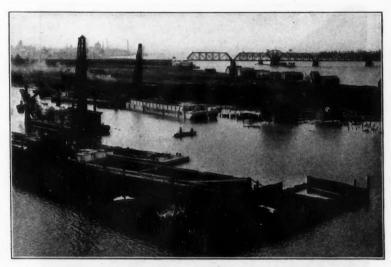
BLACK ROCK COFFER-DAM, LOOKING SOUTH. POCKET NO. 40, THE NORTHWEST CORNER, IN THE FOREGROUND.
